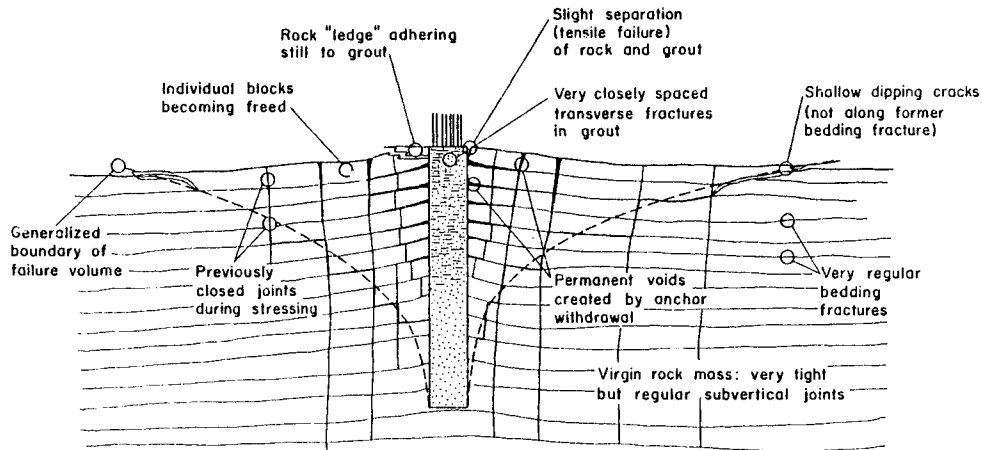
Vertical Cross-Section of Failed Anchor 3
